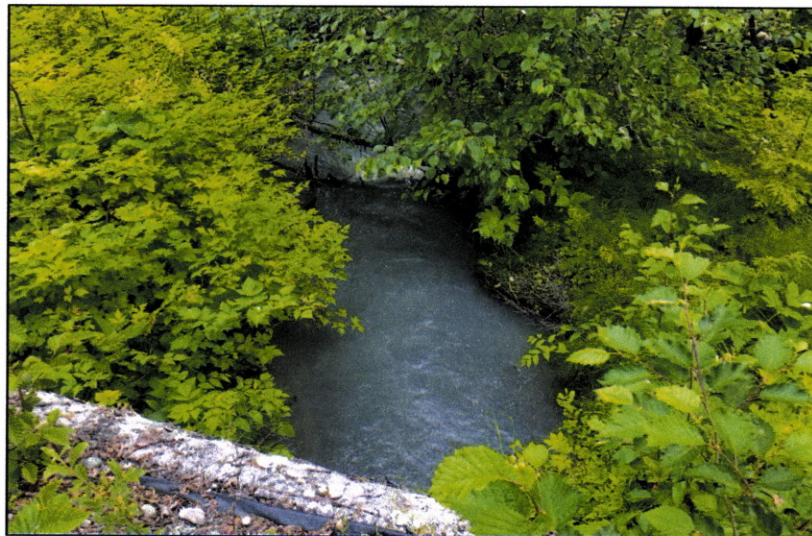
Stream going under log stringer bridge at waypoint 666.
